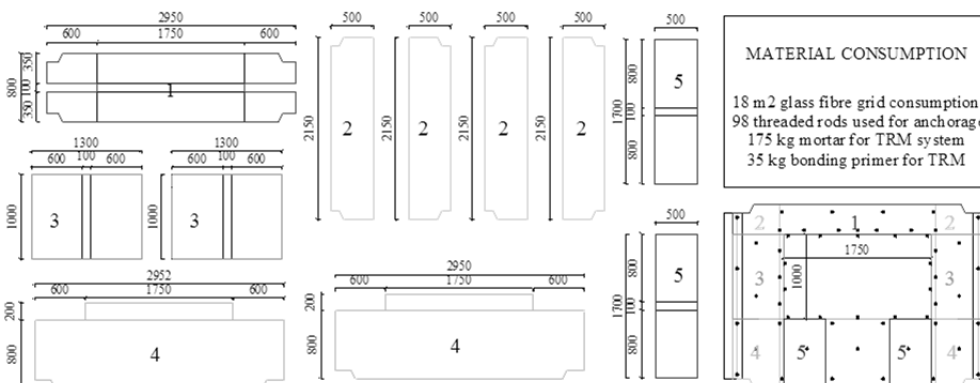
The strengthening layout of the wall with narrow window enlarged to a large window opening
